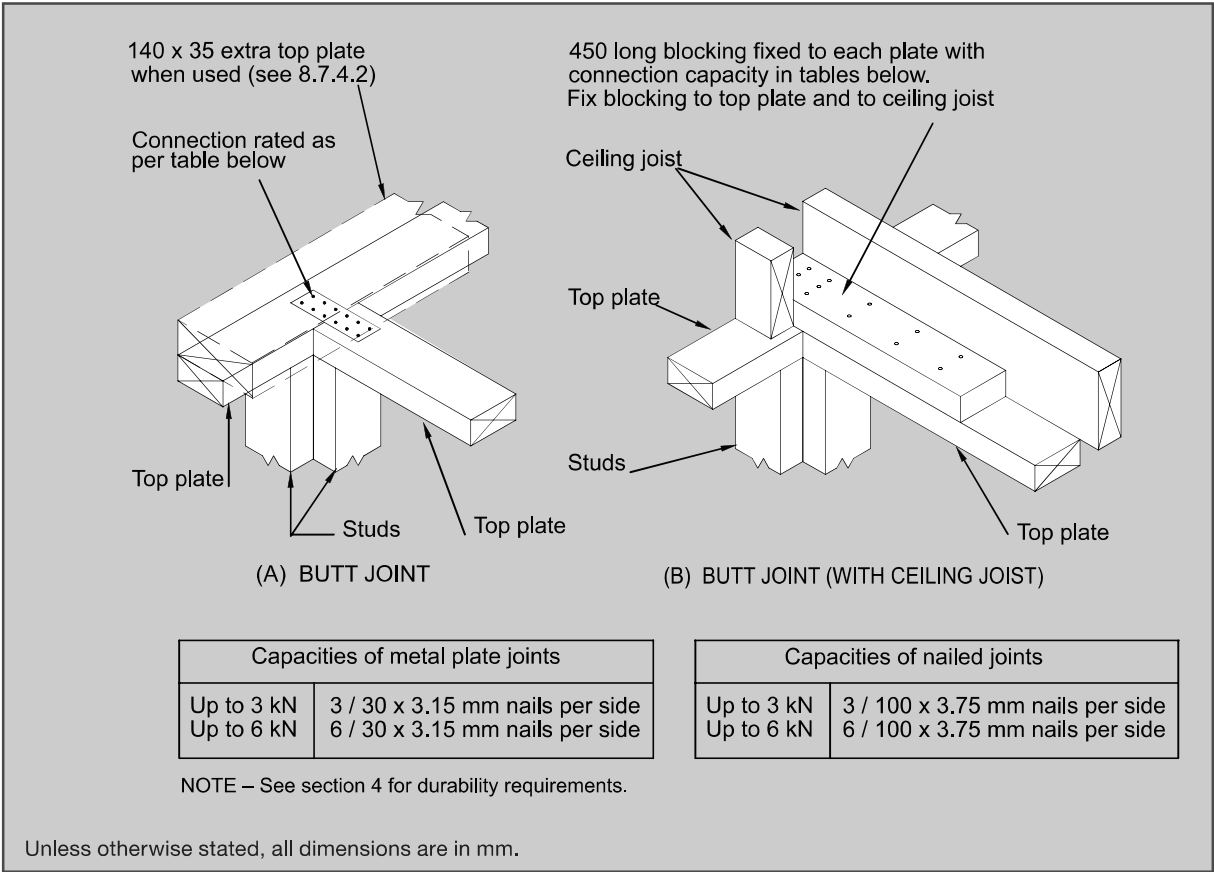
Connecting top plates to external walls at right angles – Walls containing bracing (see 8.7.3.4)
